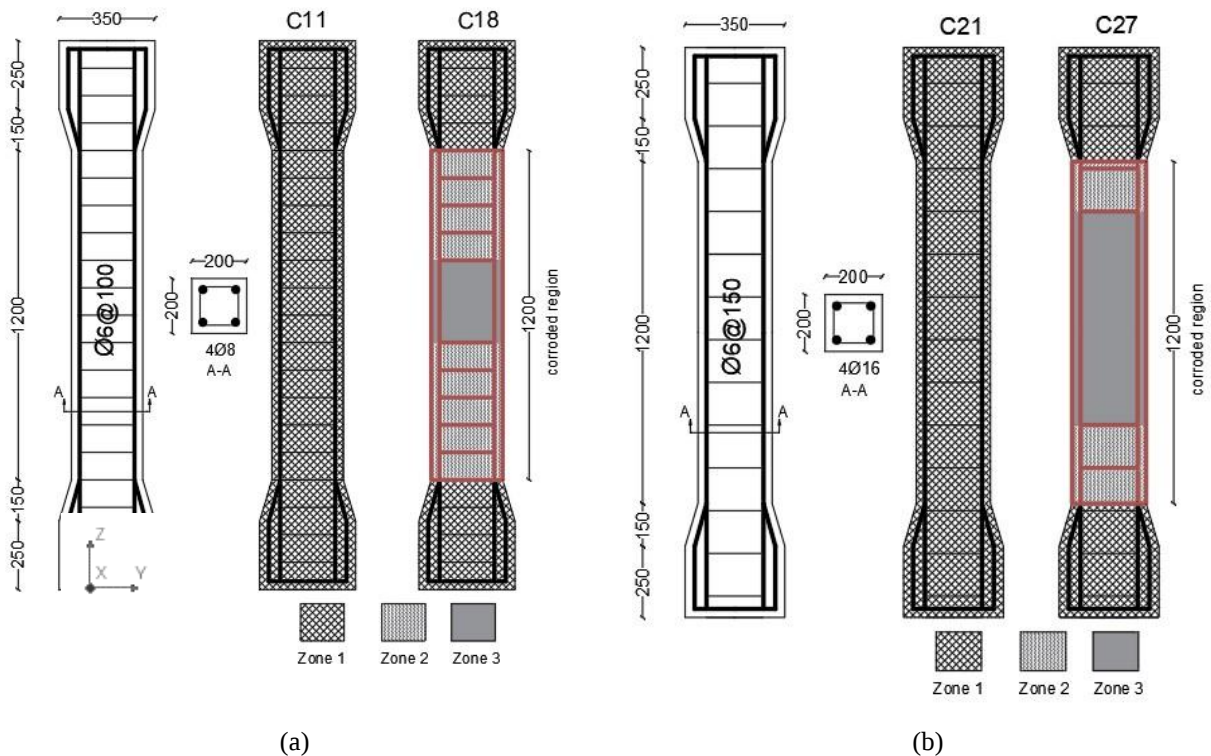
Details of RC columns tested by Rodriguez et al. (1996): (a) column type 1, (b) column type 2
